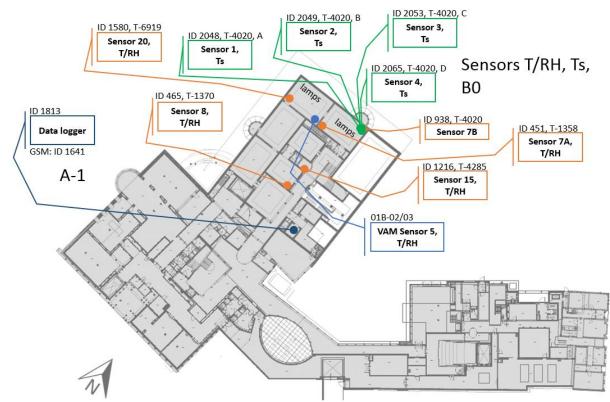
T/RH/T_s sensors, measurement locations B0, floor plan under layer by Cahen (2003).
